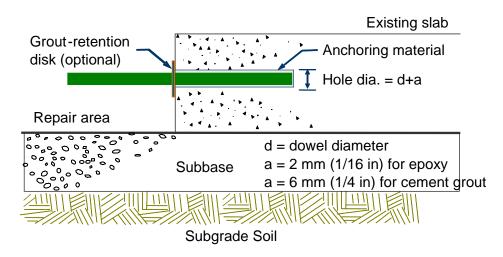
Illustration of dowel bar anchoring in slab face.
